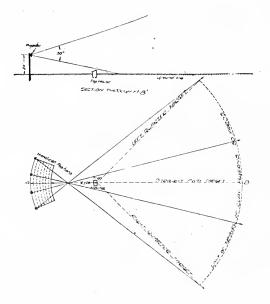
Method of Lighting Trap Shooting Ranges in Plan and Elevation
